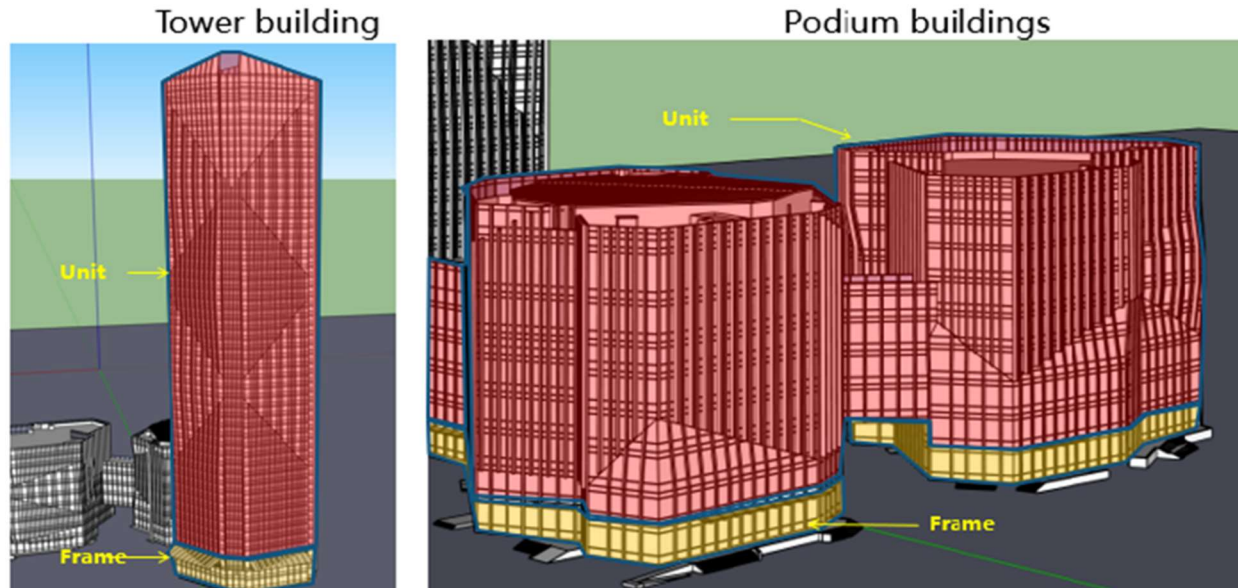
CBE HQ unitized and framed curtain wall positions
